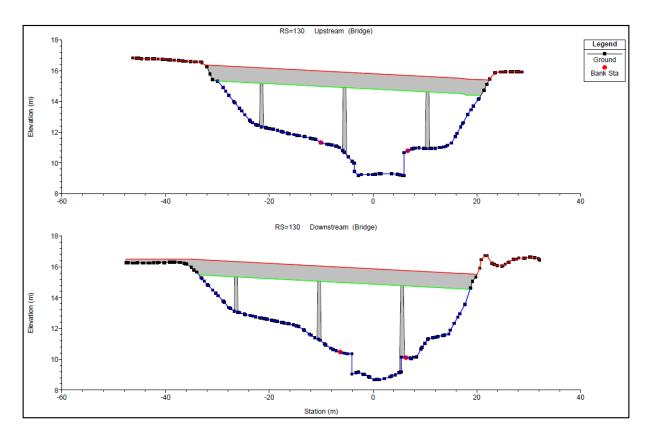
Briens Rd Bridge Section in HEC-RAS model
